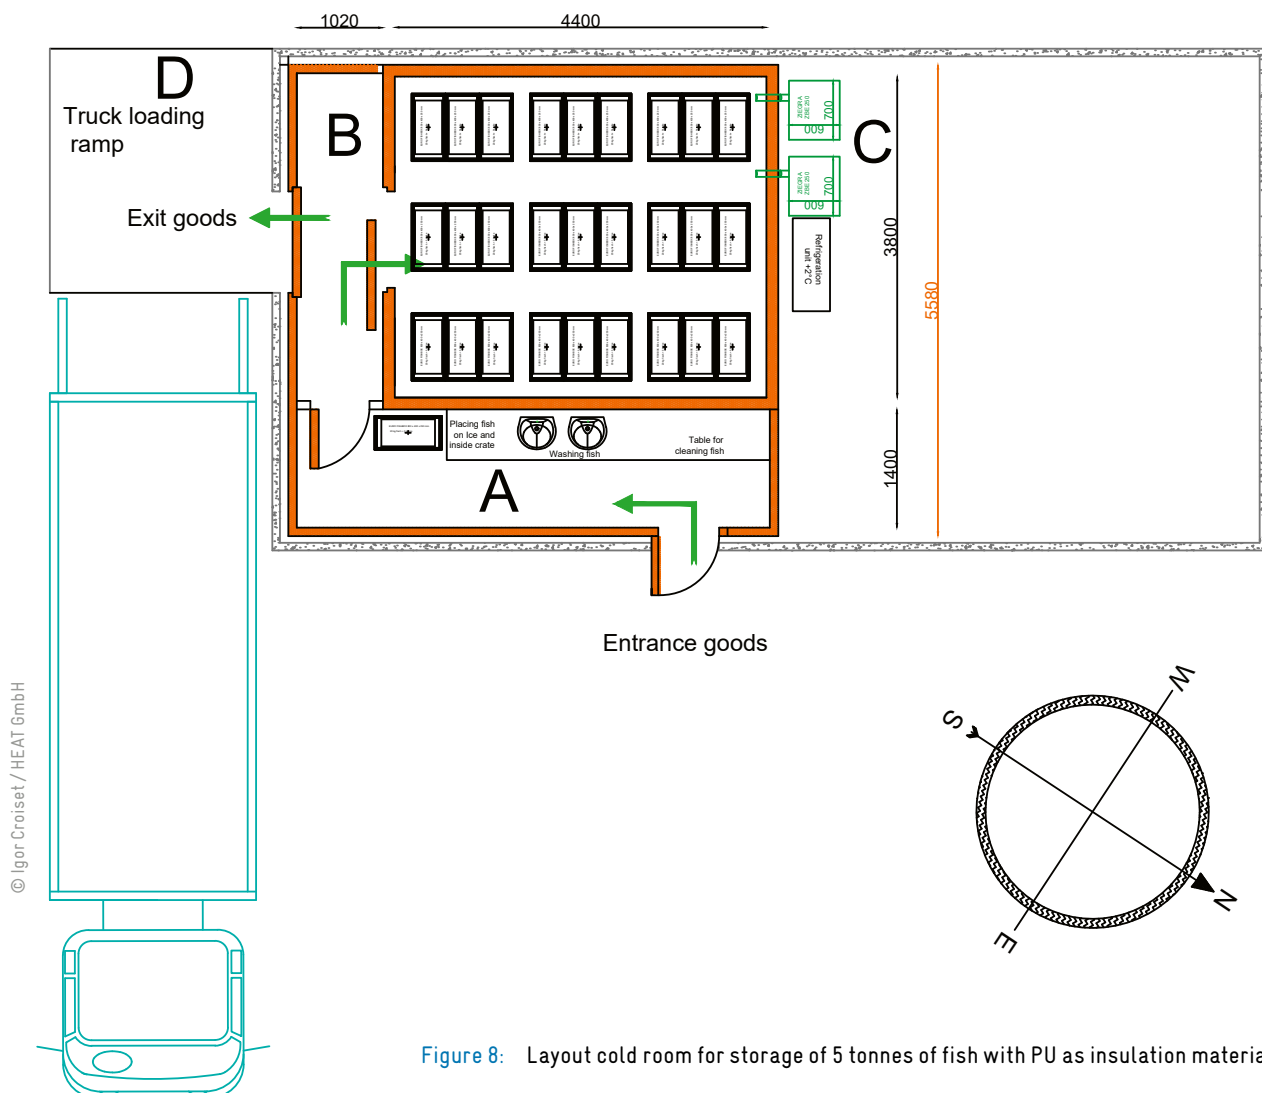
Layout cold room for storage of 5 tonnes of fish with PU as insulation material
